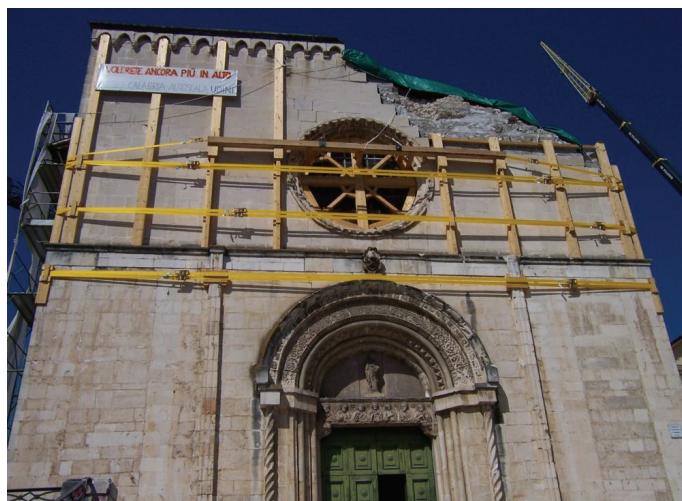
Beltling the façade of S.Pietro da Coppito church (l'Aquila)
